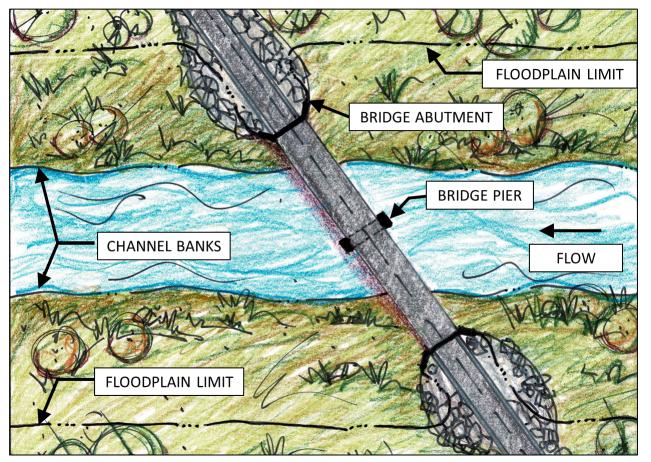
Plan-view illustration of a pier and abutments that are misaligned to the flow direction.
